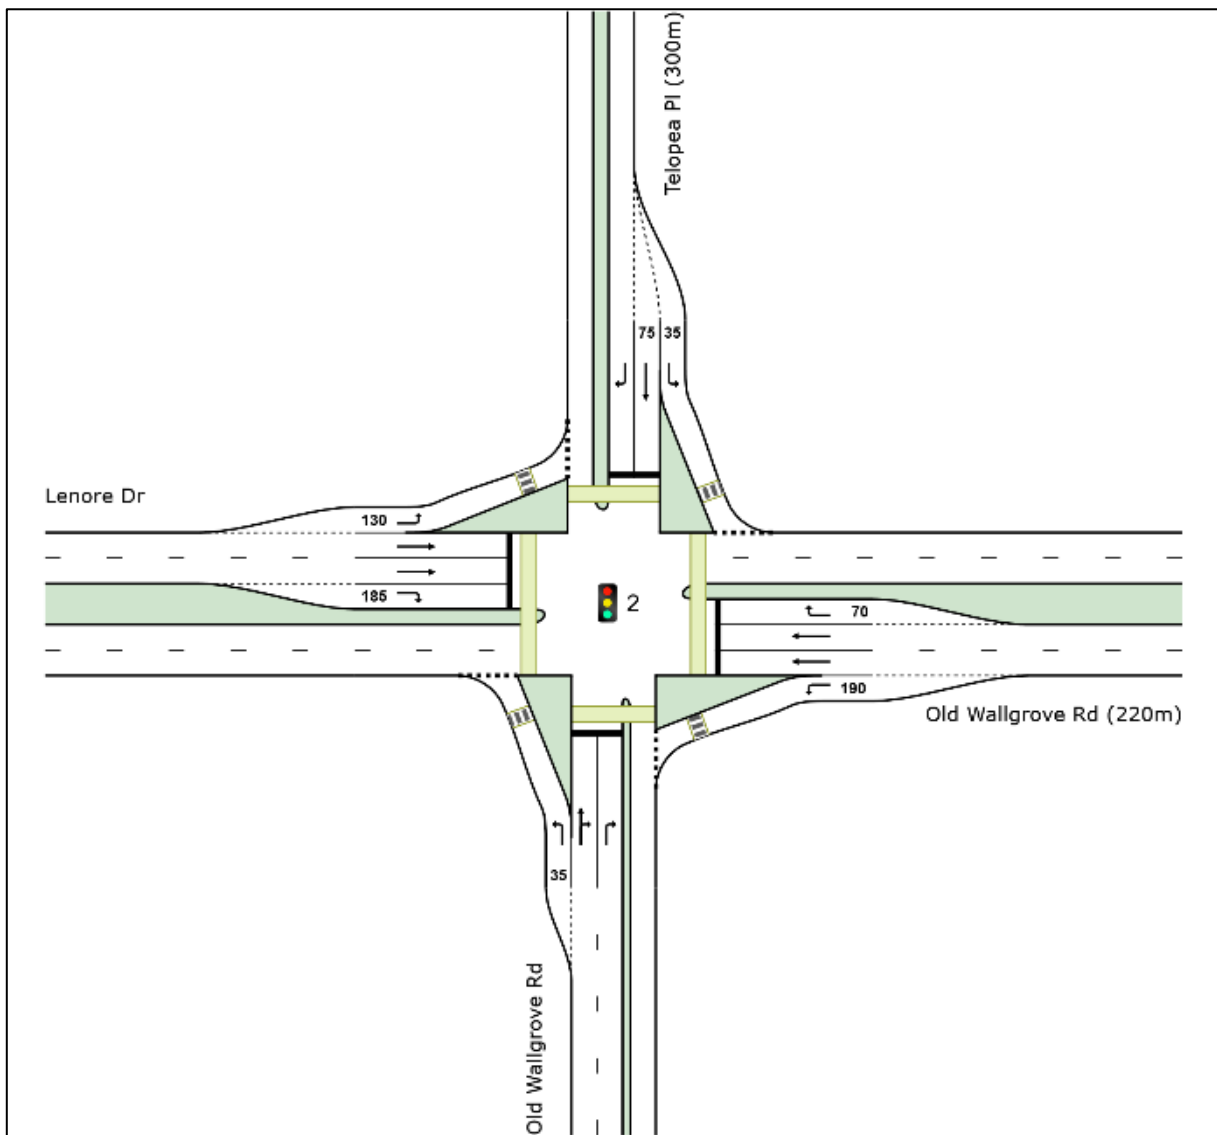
Old Wallgrove Road / Lenore Drive Intersection Layout
